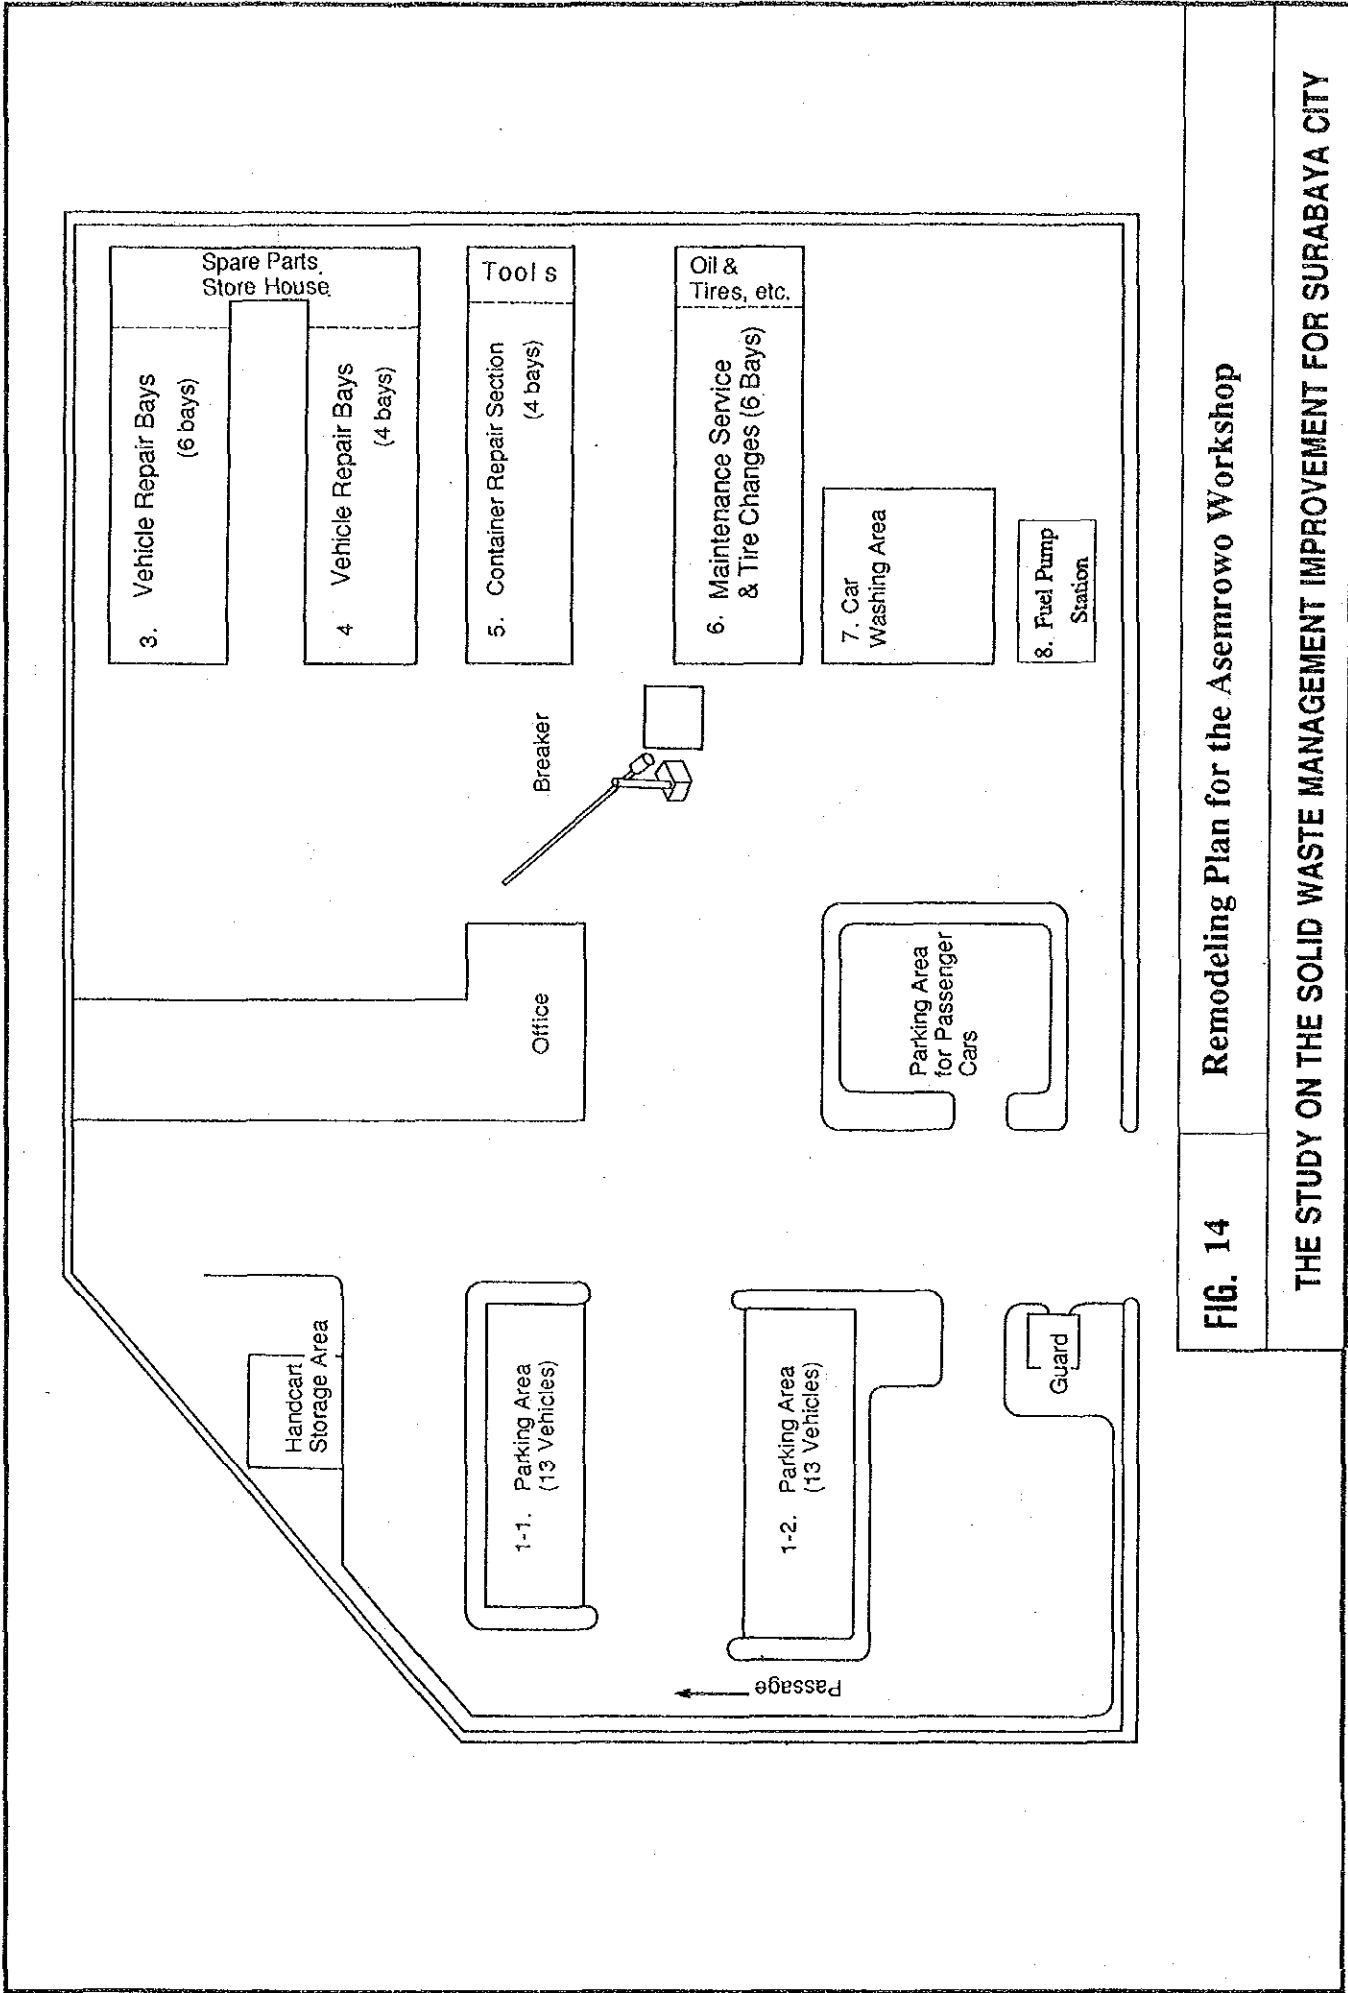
Remodeling Plan for the Asemrowo Workshop
